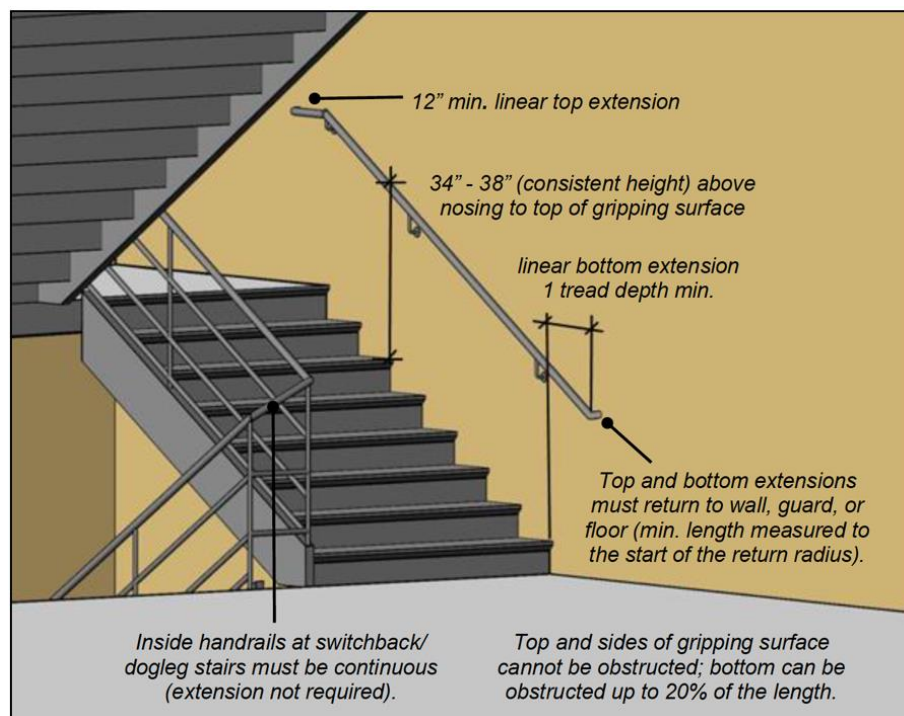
Stairway and Handrail Requirement[Source : (I.B.C., 2017)]
